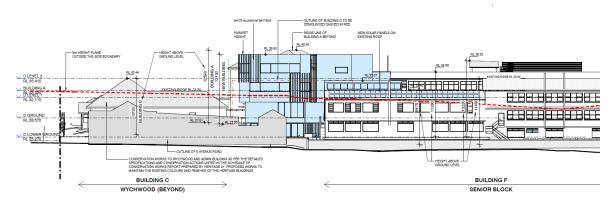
Extract of North elevation (Drawing DA-200 Rev 14 DJRD Architects)
